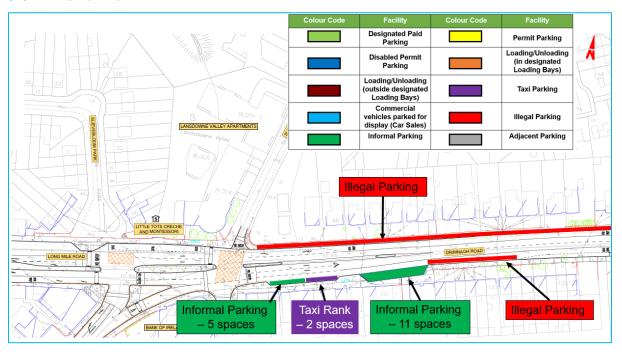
Walkinstown Road/Long Mile Road/ Drimnagh Road junction
